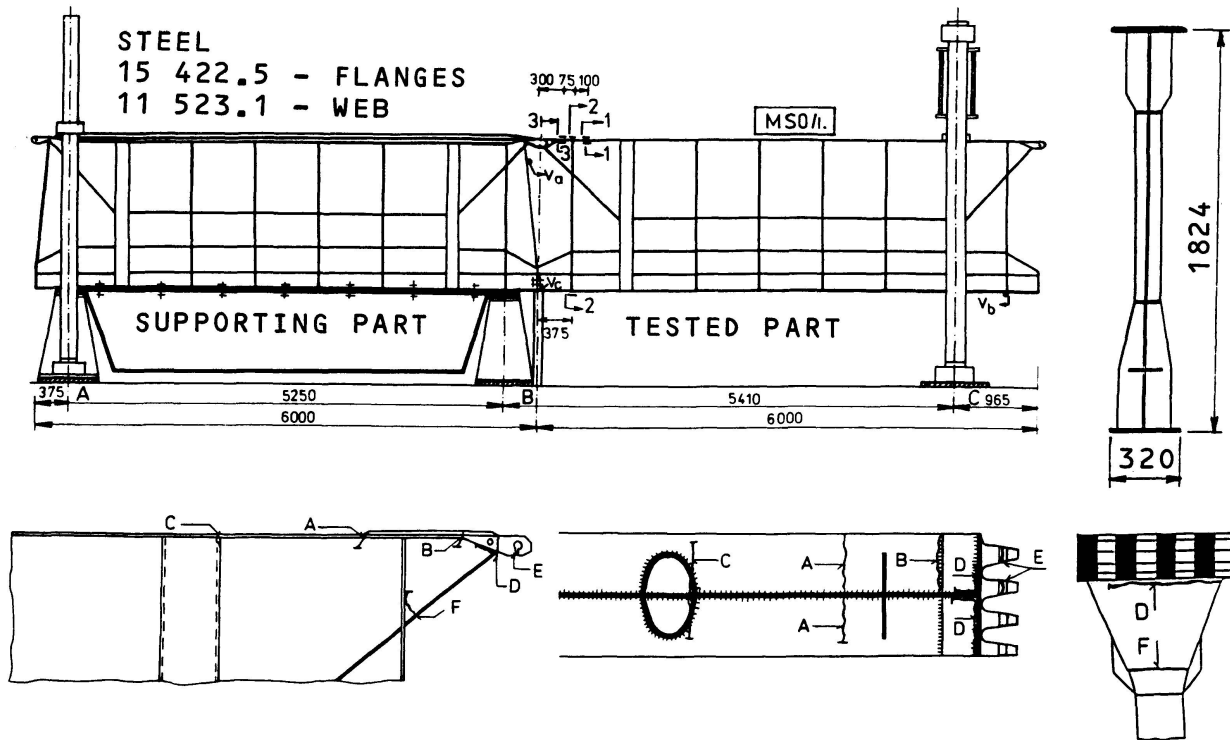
Static and geometric scheme of test system 1. Positions of fatigue cracks.
